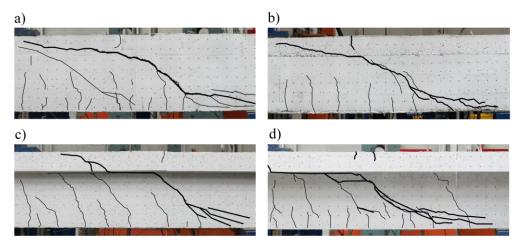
Examples of the test specimens crack patterns: a) rectangular monolithic beam HOP4B1; b) rectangular composite beam NOP1B2; T-shaped monolithic beam NOP3C1; d) T-shaped composite beam HOP4D2.
